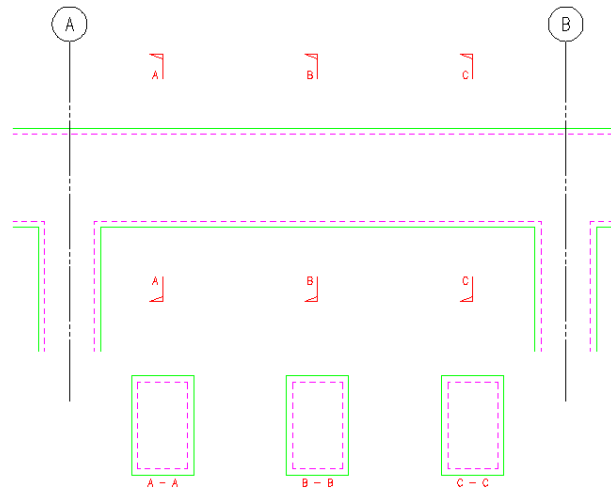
1 Beam Detailer Beam Type Selection
